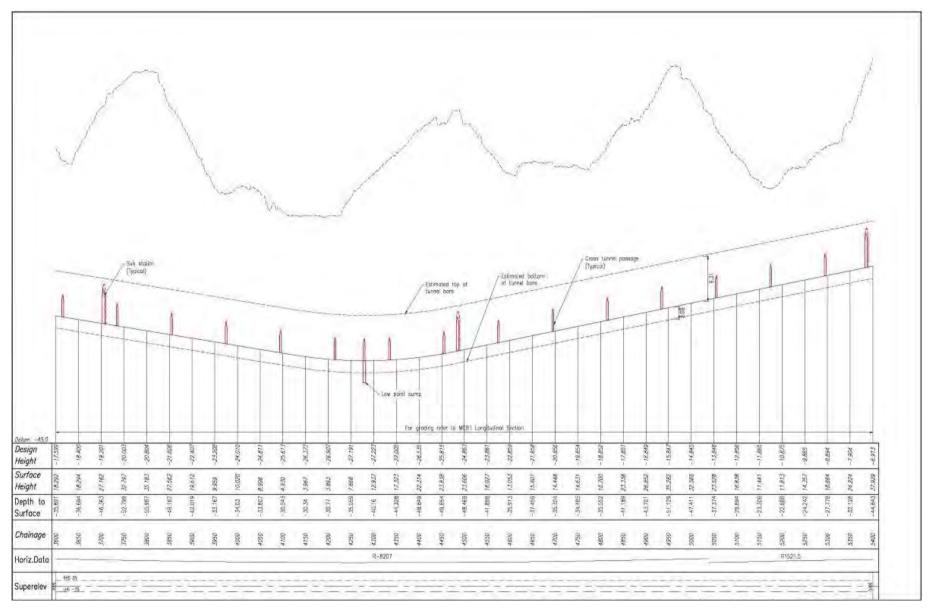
Eastbound tunnel vertical alignment –Thomas Street to Plunkett Street
